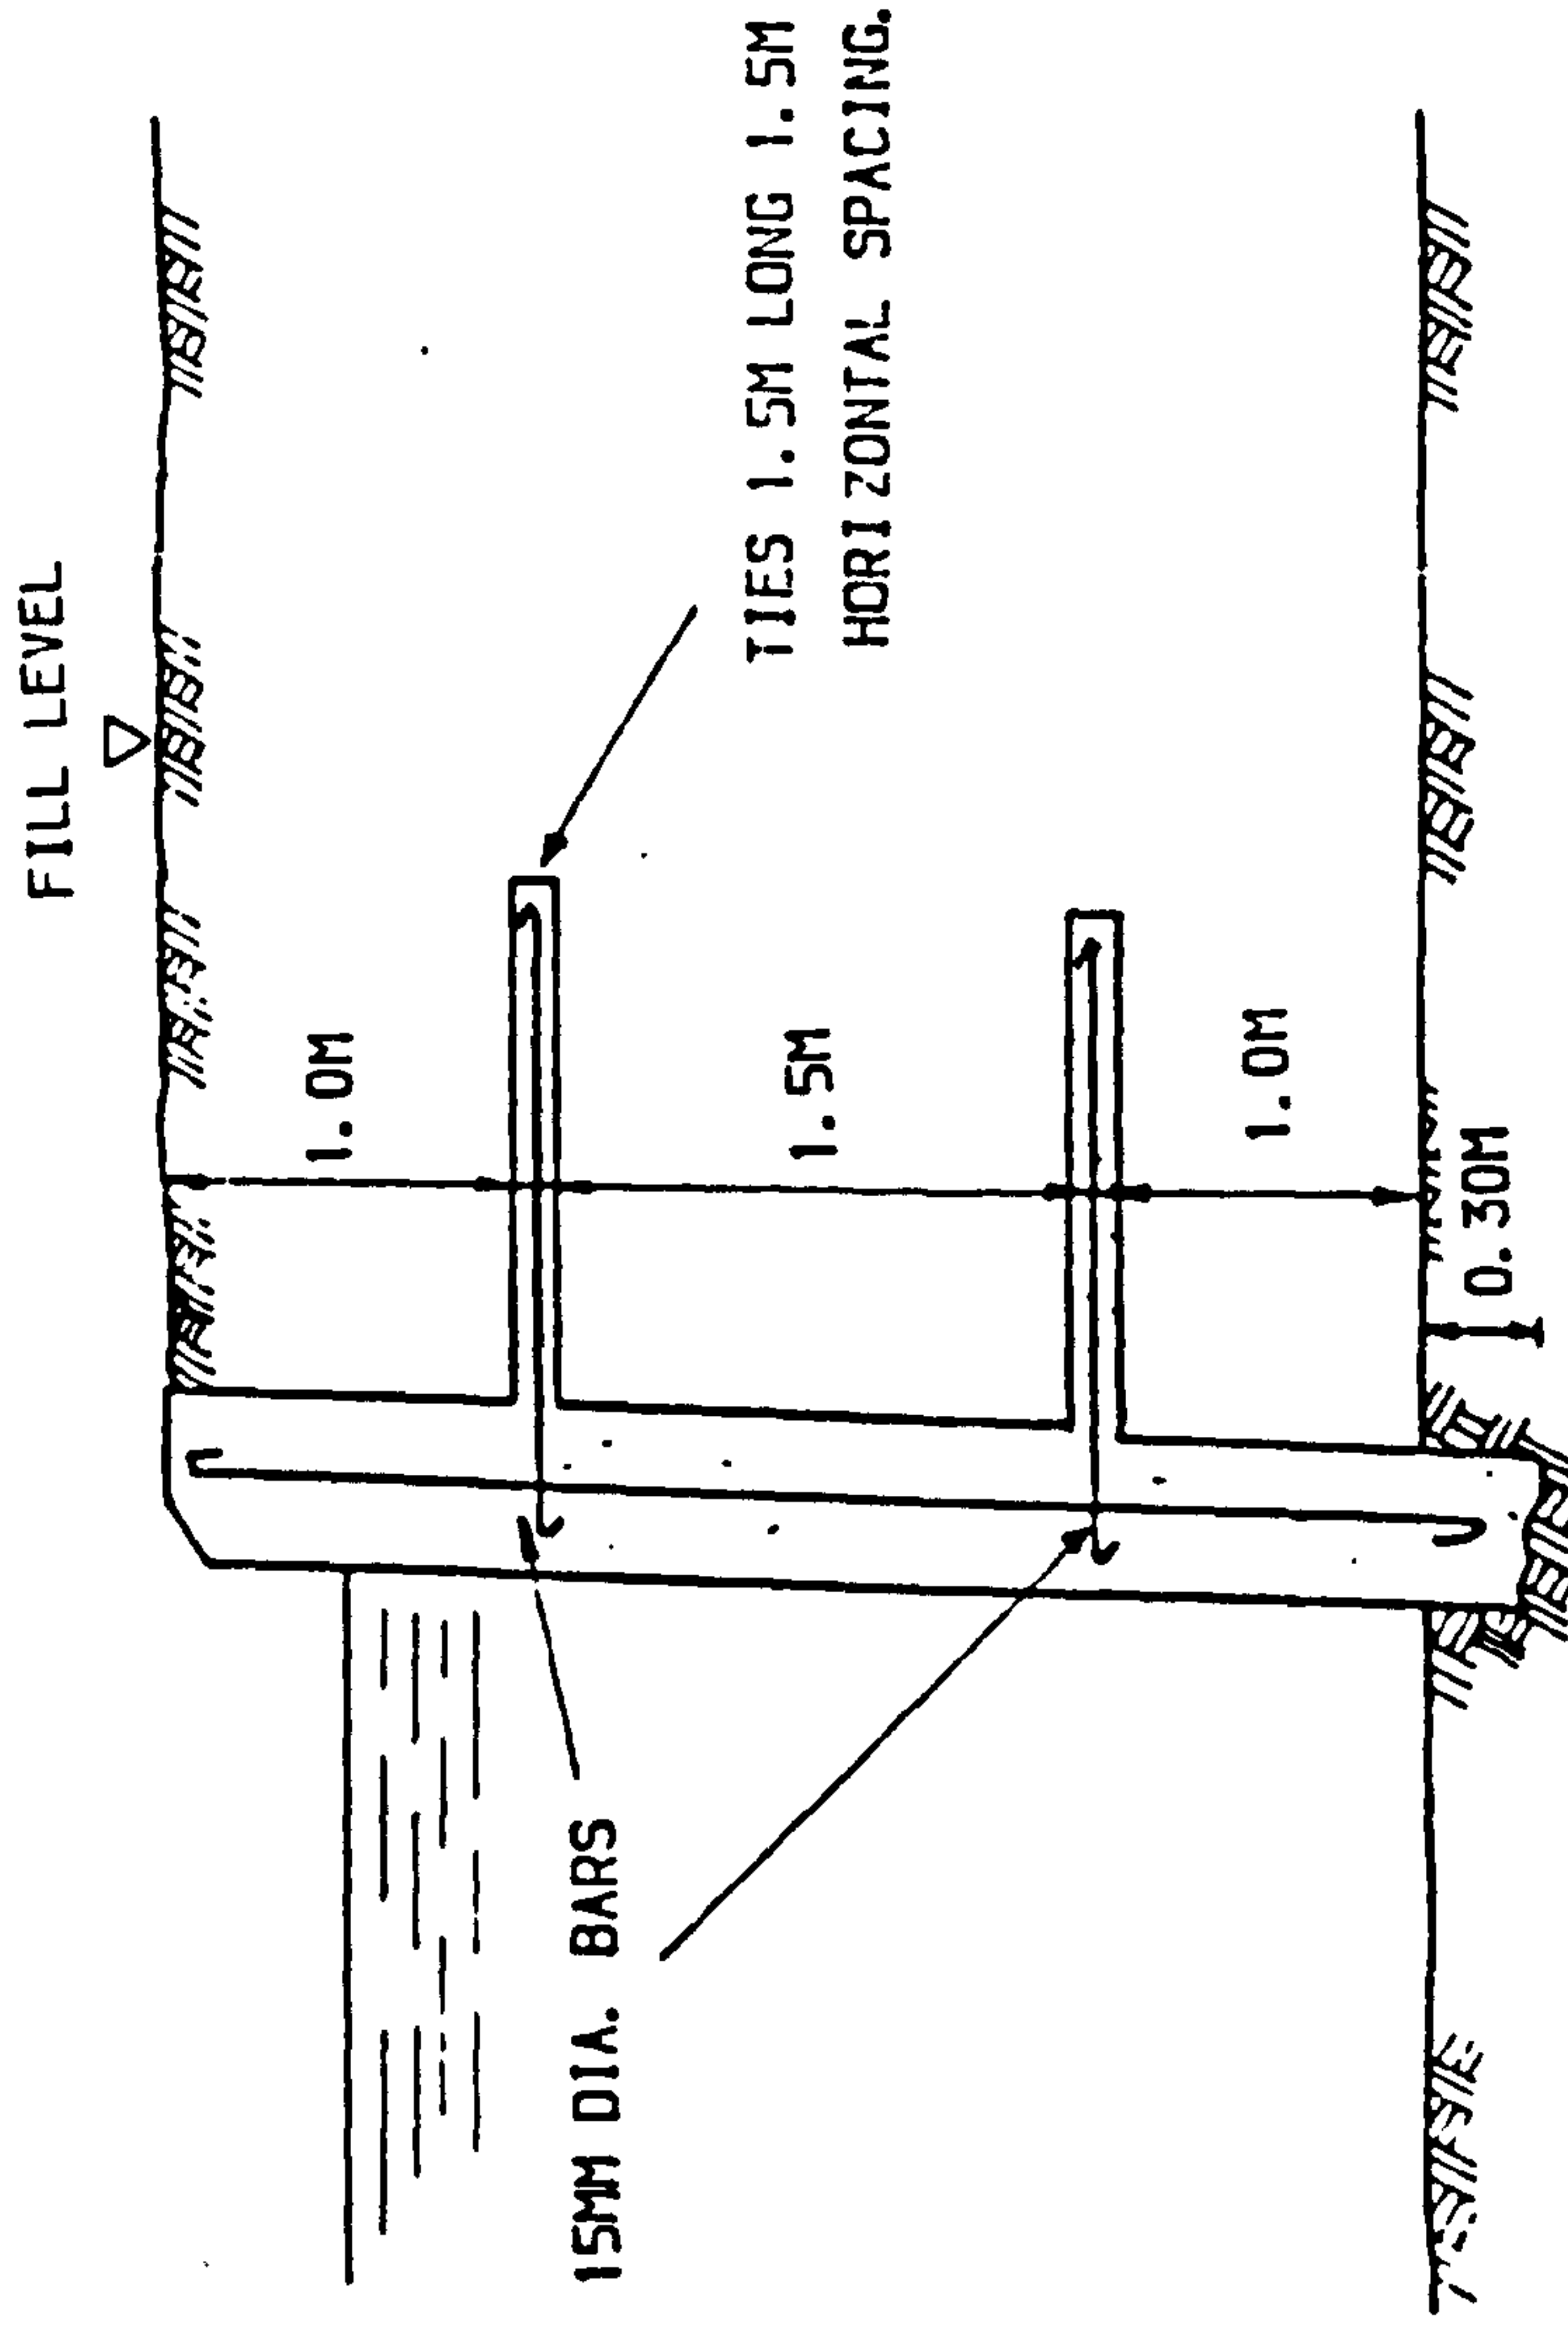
RETAINING WALL AT BREST (AFTER COYNE, 1927).
